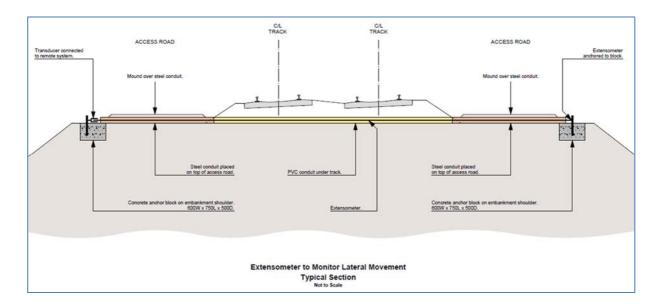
Details of proposed extensometers across the crest of the embankment
